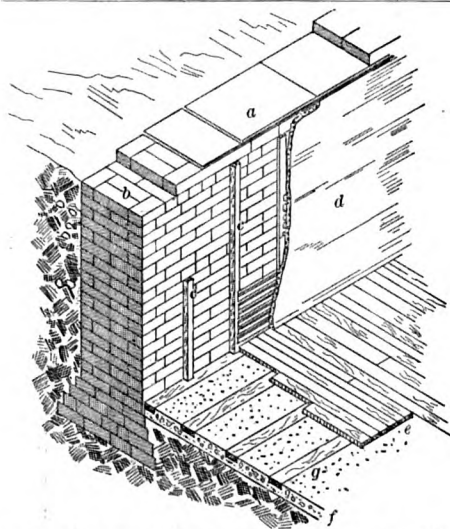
COMMON OR IMPERFECT BRICK FOUNDATION-WALL.
